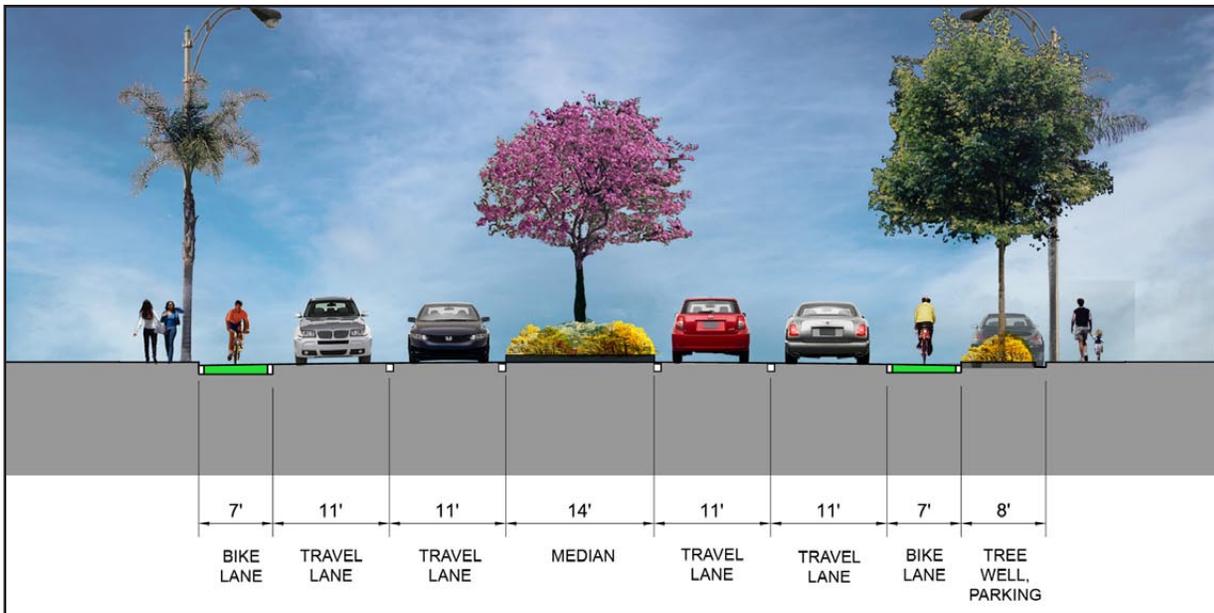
Durfee Avenue from East Rush Street to Thienes Avenue, facing north — Proposed.
